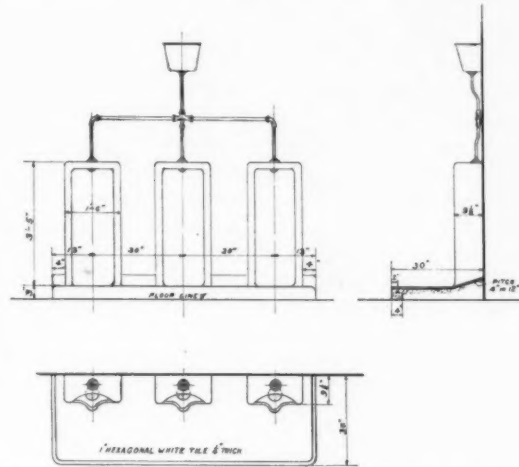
The urinals in plan, elevation and section, showing the special raised floor construction.
